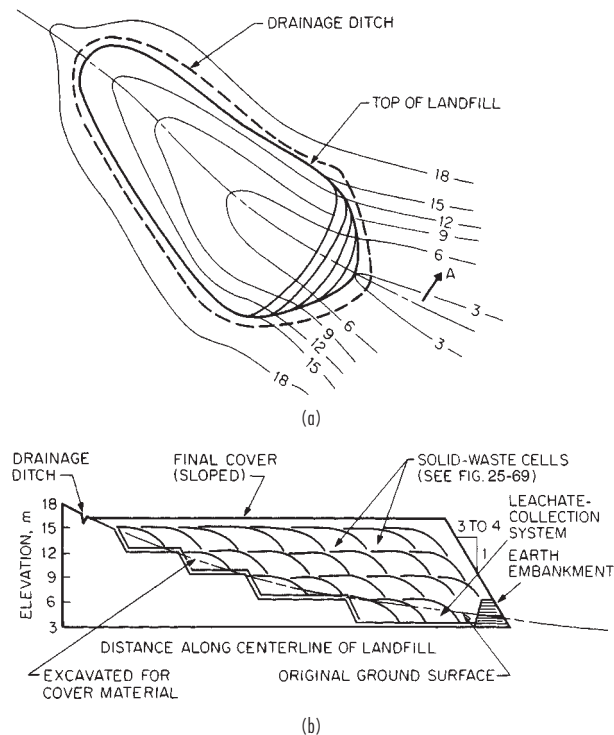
Depression method for landfilling solid wastes. (a) Plan view: canyon-site landfill. (b) Section through landfill.
